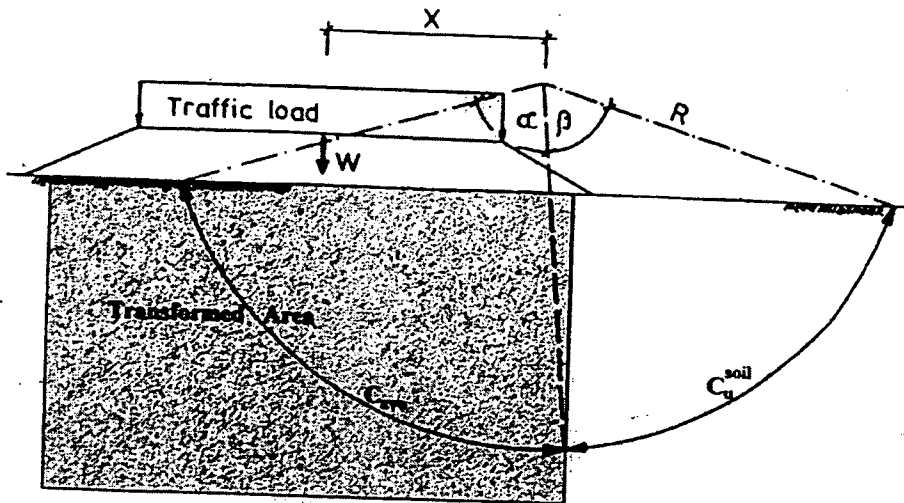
Transformed Area for calculating factor of slope stability (Sweroad, 1992)
